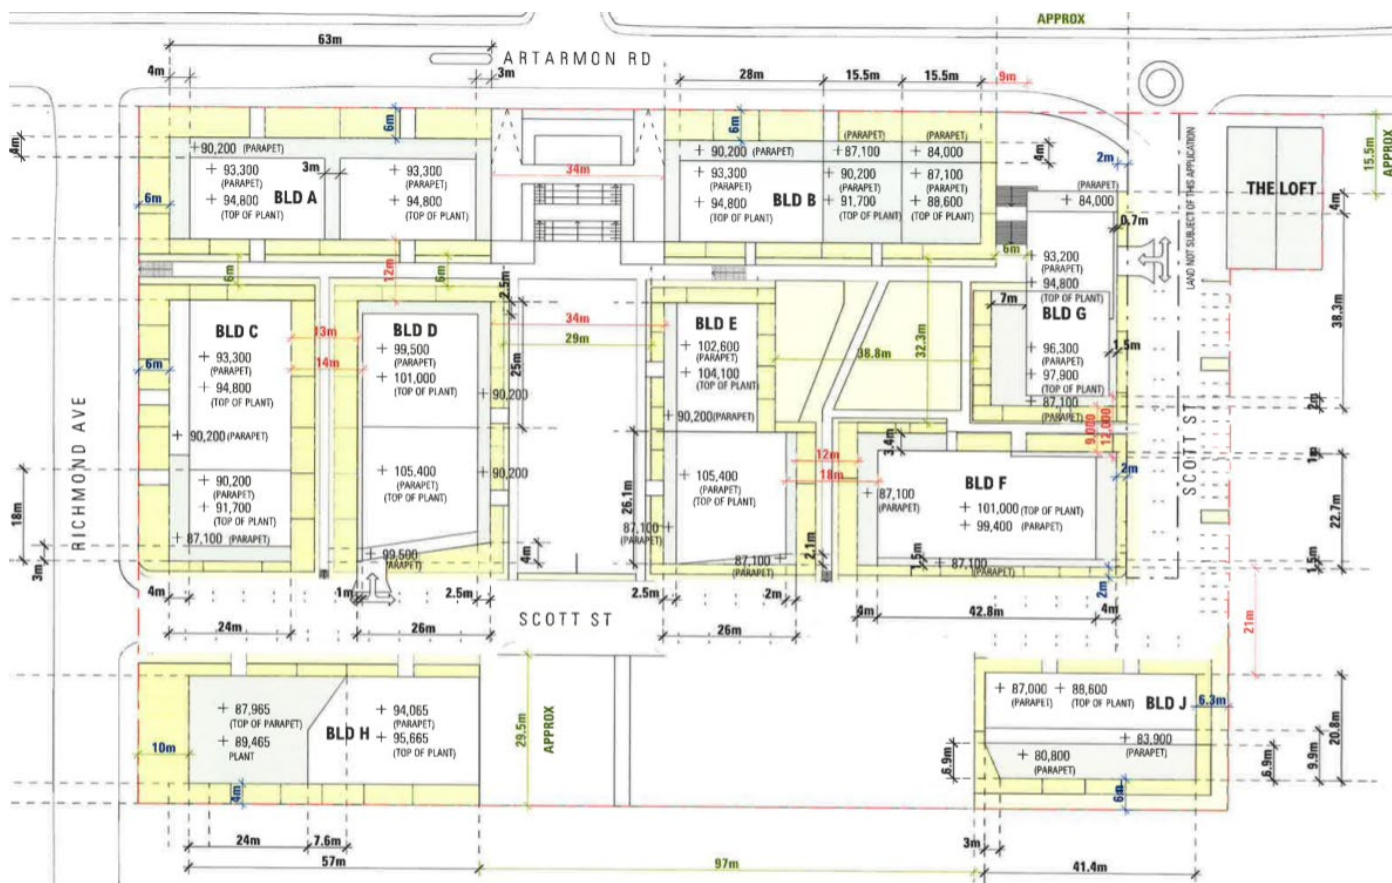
Extract from approved Concept Plan Drawings (as amended by MOD 2)
